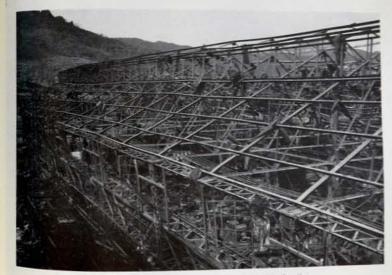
3,200 feet from GZ. Group 26, Building 11A. Broken column in north wall of building.
